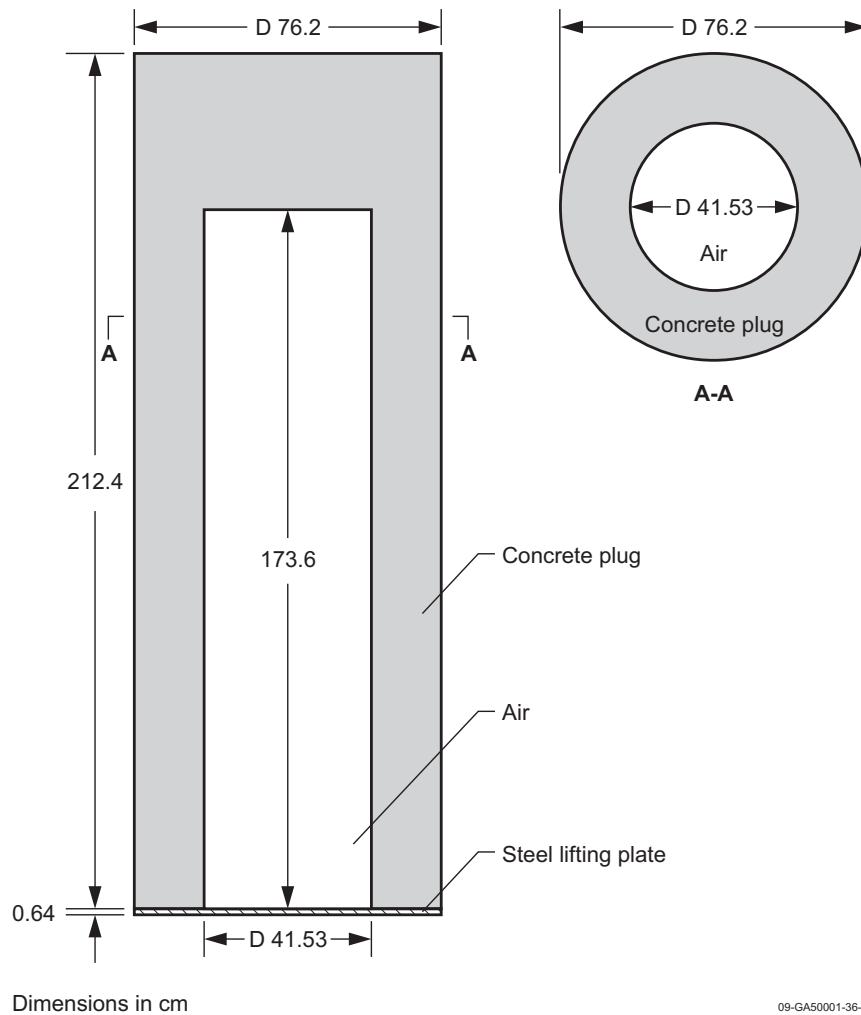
Vertical Cylindrical Cross Section Reported for the 30 × 0, 1.2% B Concrete Plug.
